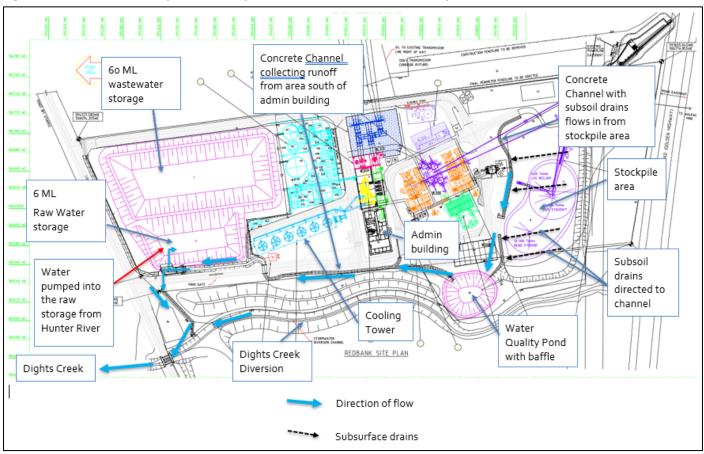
Stormwater capture, conveyance and retention at the Facility.'
